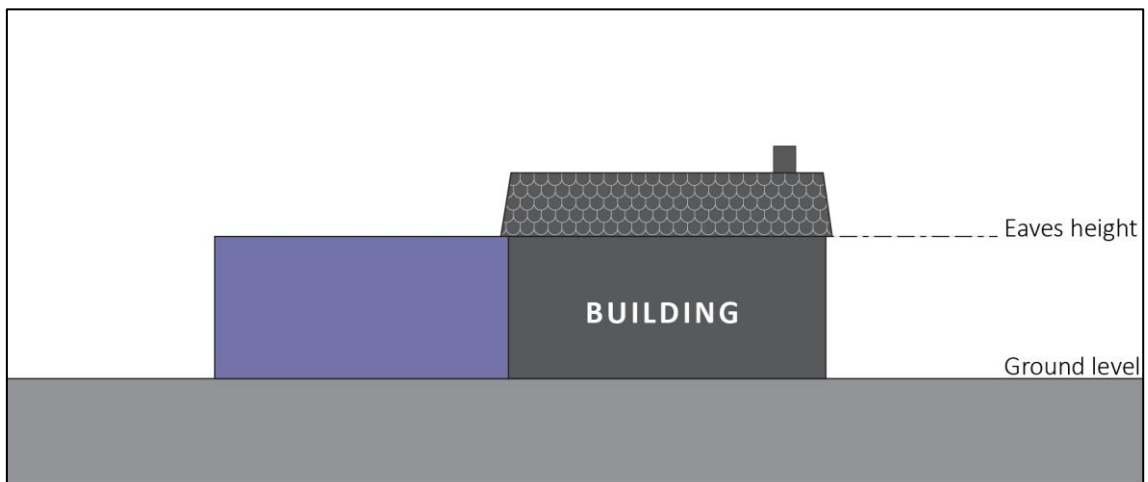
Construction of a single-storey addition or extension to an existing building is exempt if the walls of the addition do not exceed the eave height of the existing single-storey building; note this graphic does not indicate or specify the form of the roof to the addition
